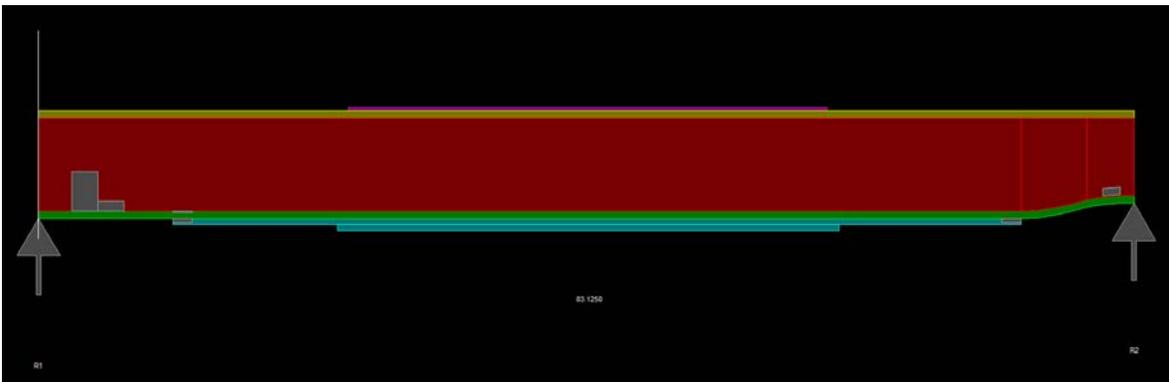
Span 4 Steel Girder modeled in LARS Bridge
